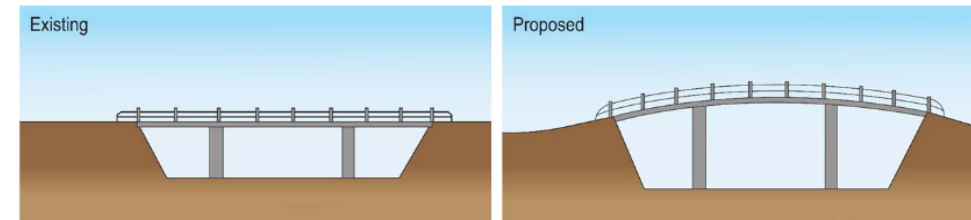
Increasing the size of a bridge opening by raising the bridge deck can increase flow volume under the bridge.
